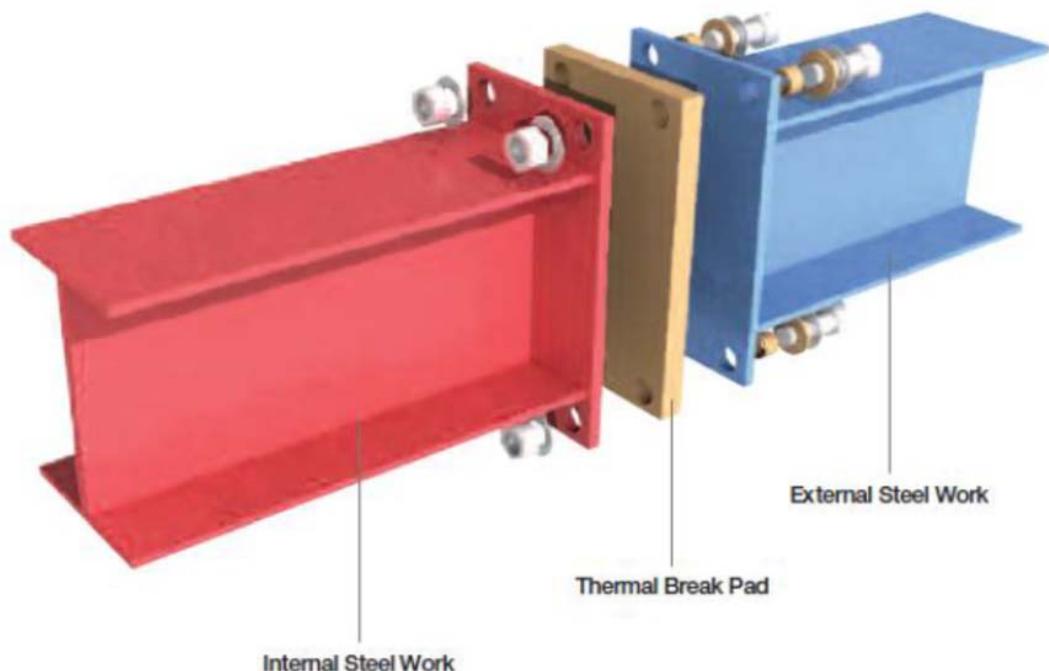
Armadillo thermal break plate between internal and external steelwork
